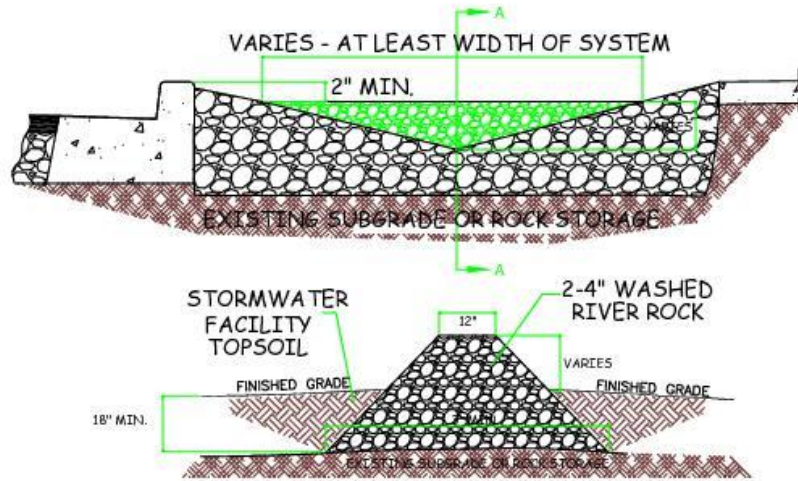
Plan view of LISD Curb Extension Systems (Trinkaus Engineering, LLC - 2017)
